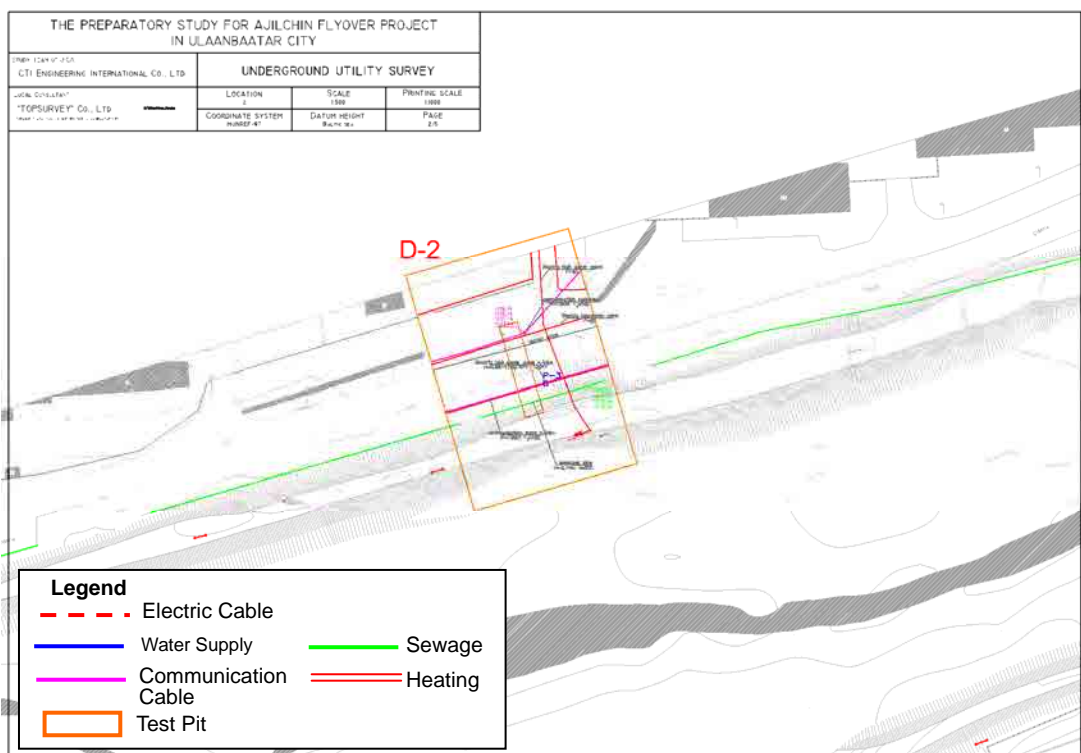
(2) Detailed Figure of Test Trench Location (D-2)
